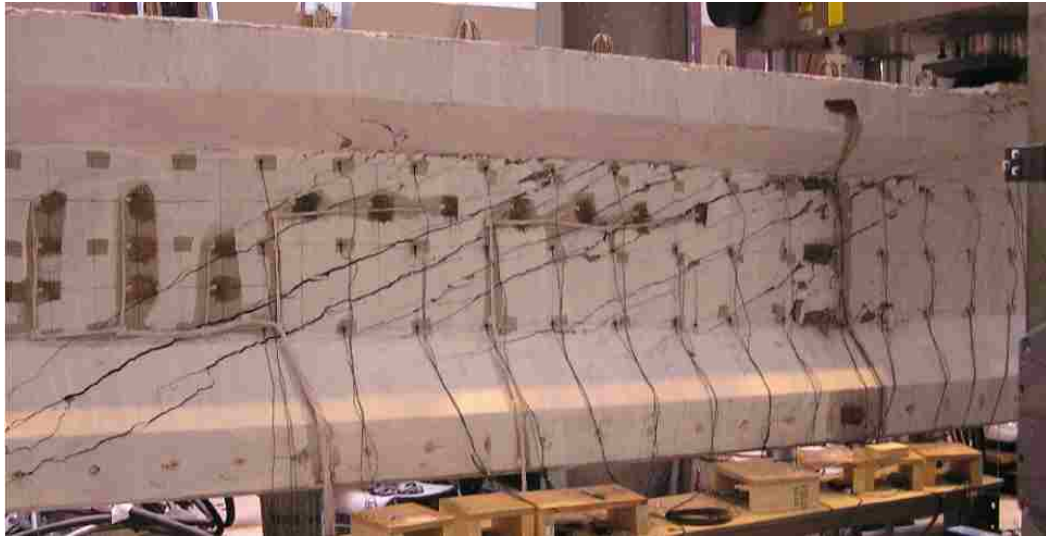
Shear failure of a prestressed concrete beam, from [Runzell et al. 2008]
